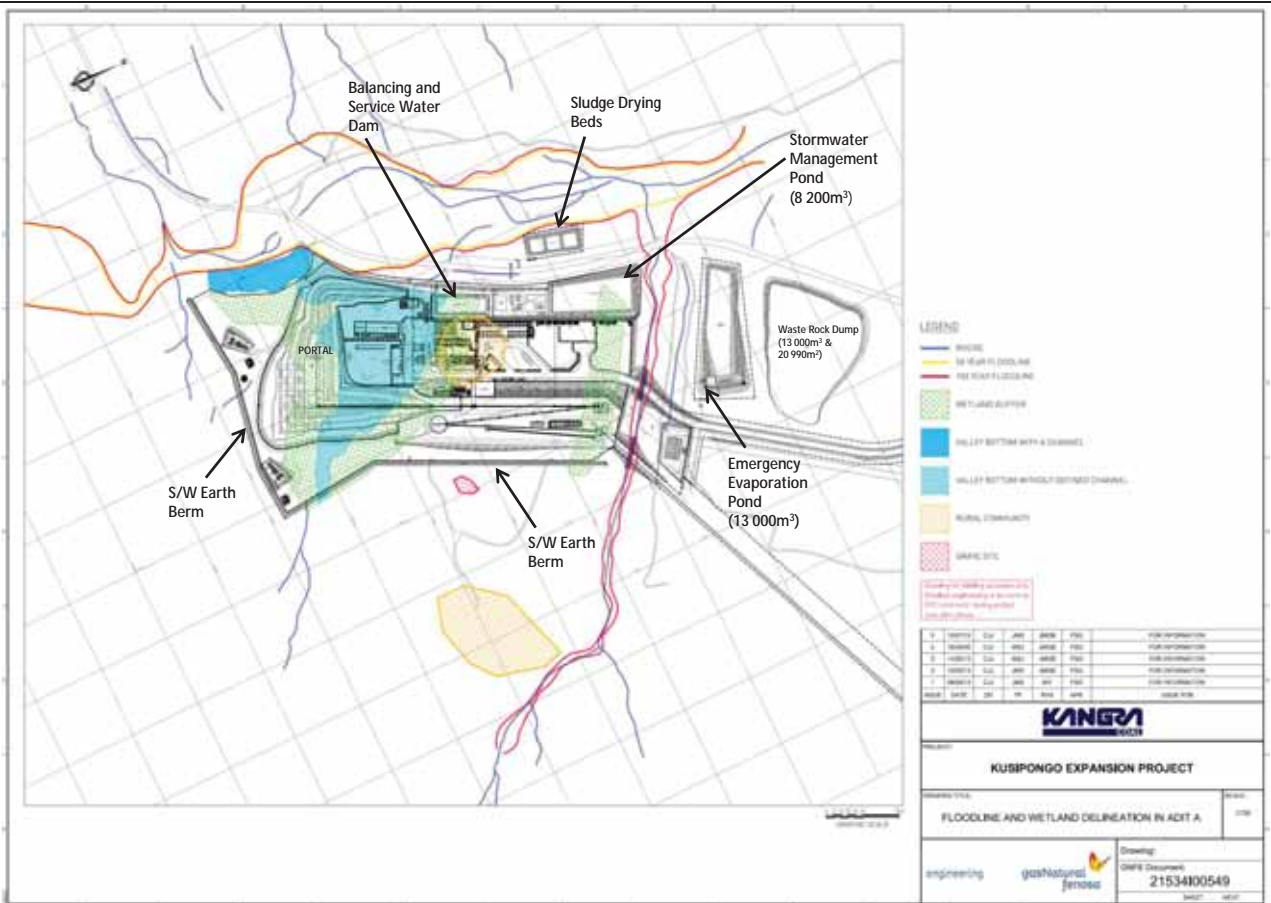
Proposed Site Layout for the Main Mine Adit (Adit A)
